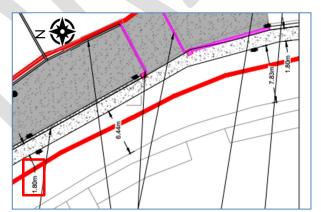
Extract of Proposed Footway widths from preliminary design drawings
